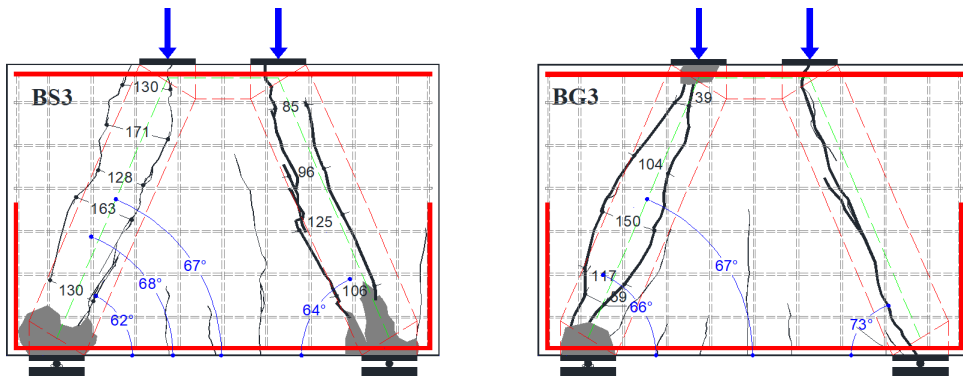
Crack pattern and mode of failure for web reinforcement ratio 0.40% (shaded area indicates crushed concrete)
